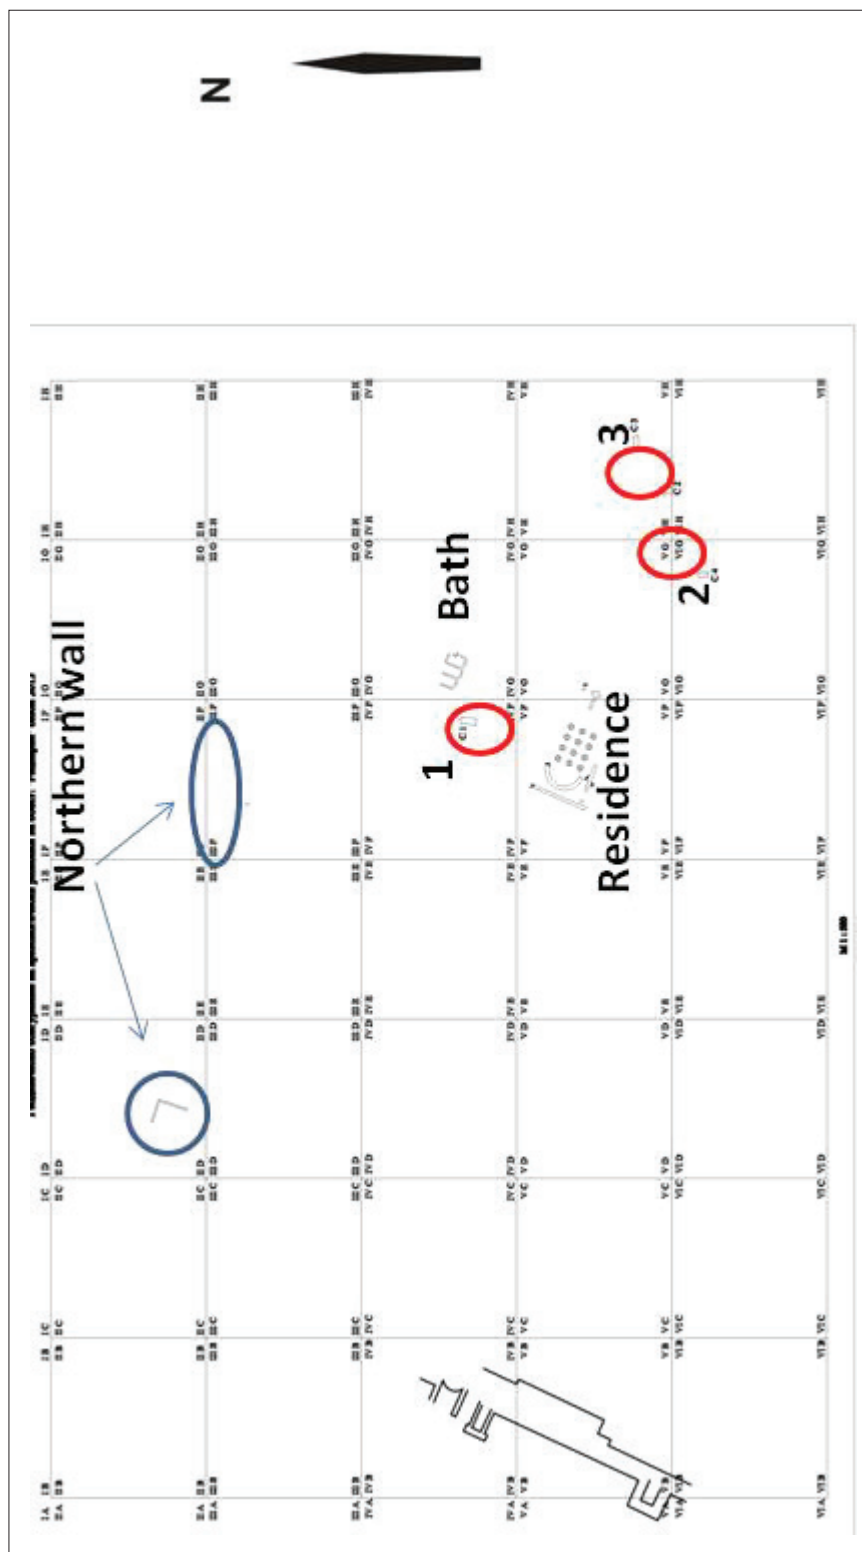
The new geodetic plan and net of Ratiaria in sector of Western fortress wall and Residential building with the new founded bath complex and stratigraphic trenches (Nr. 1–3);
